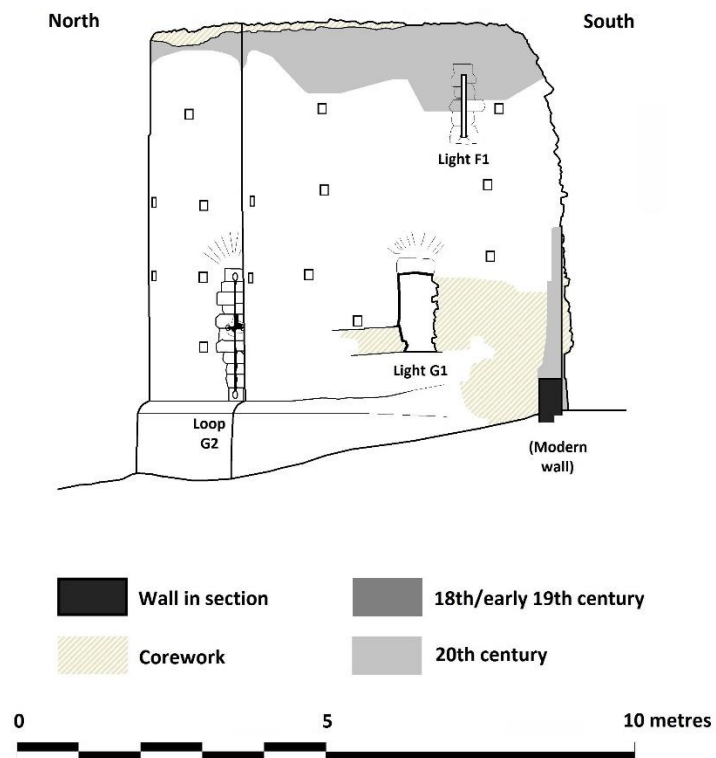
Leybourne Castle gatehouse, east tower and passage – west-facing elevation
